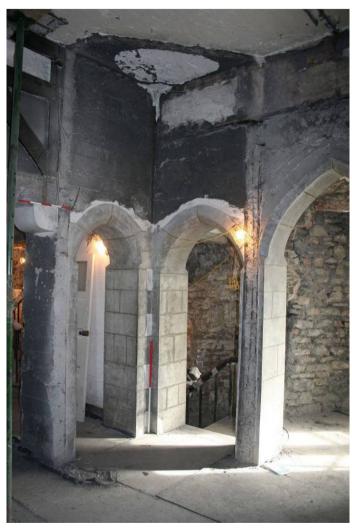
Eastern side of first floor showing doorway to stairs and Study on right hand side of photograph
